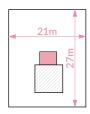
Hofhaus schema built between 1876-1900 S 1:1000
